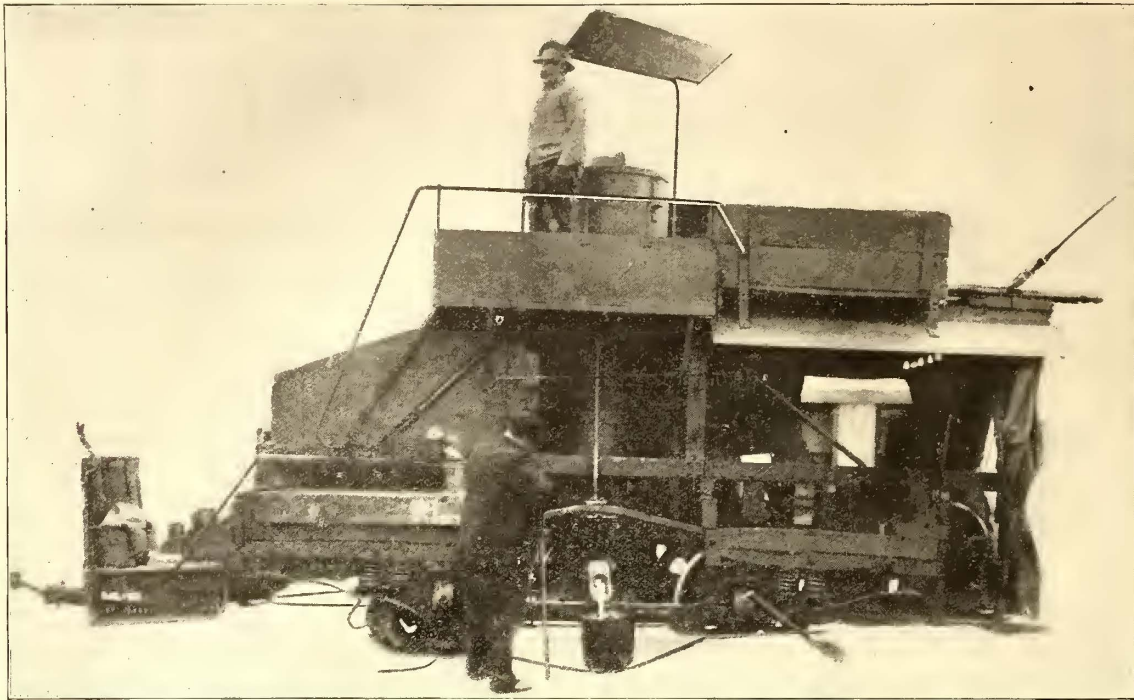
CUPOLA CAR, CAST WELDING IN MILWAUKEE
